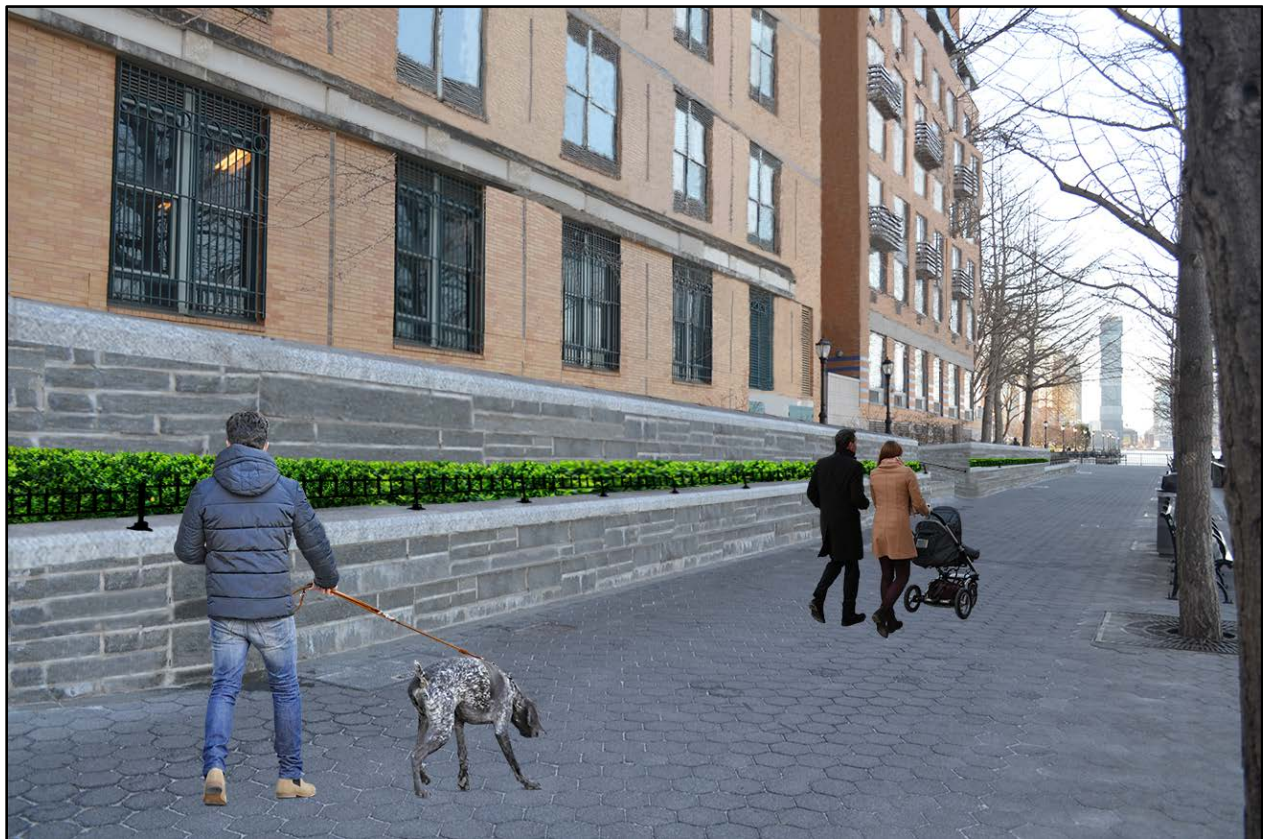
Existing Conditions in Segment 2, Existing Planting Beds and Doors
